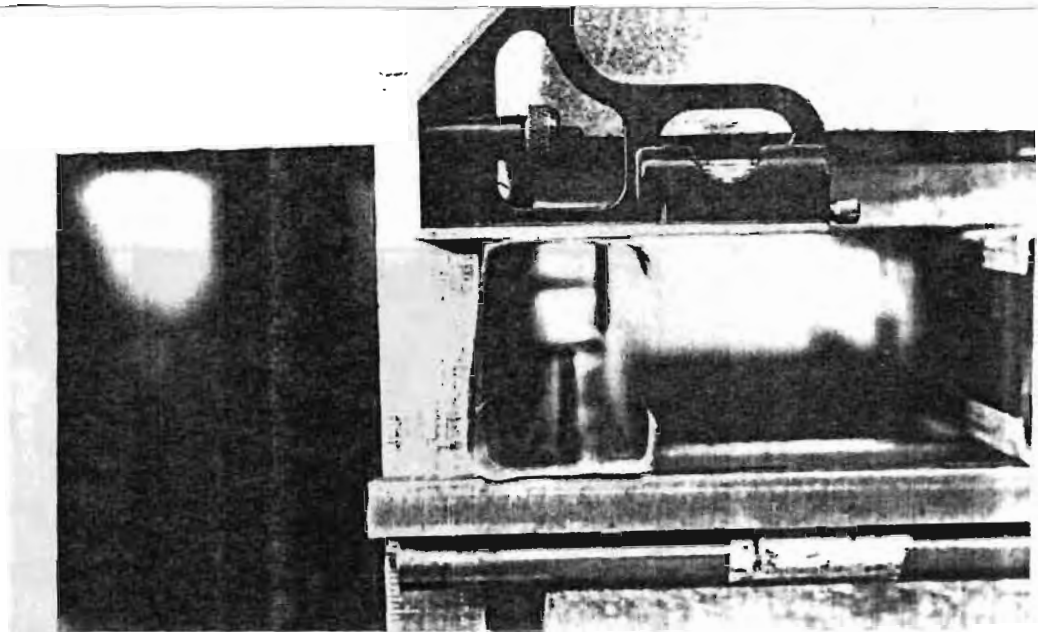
Typical Web Crippling Failure, Specimen EOF-SU-10-3(#2)
